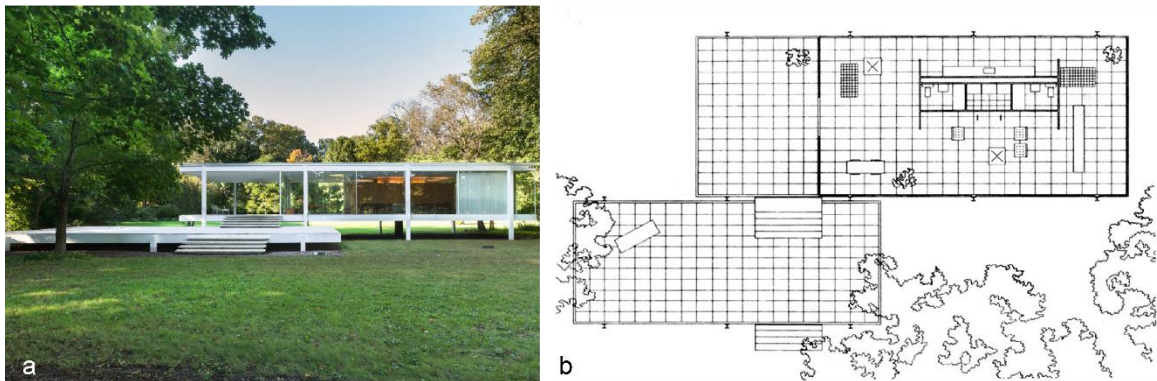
(a) Farnsworth House Façade and (b) Floor Plan by Mies van der Rohe (Manuel, 2013)
